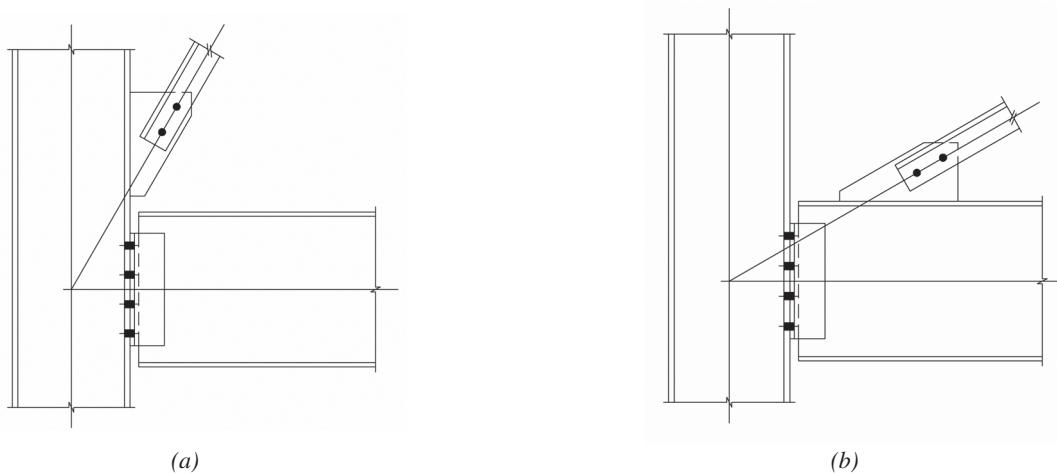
Nonstandard vertical brace connections. (a) Gusset plate welded directly to column. (b) Gusset plate welded directly to beam.
